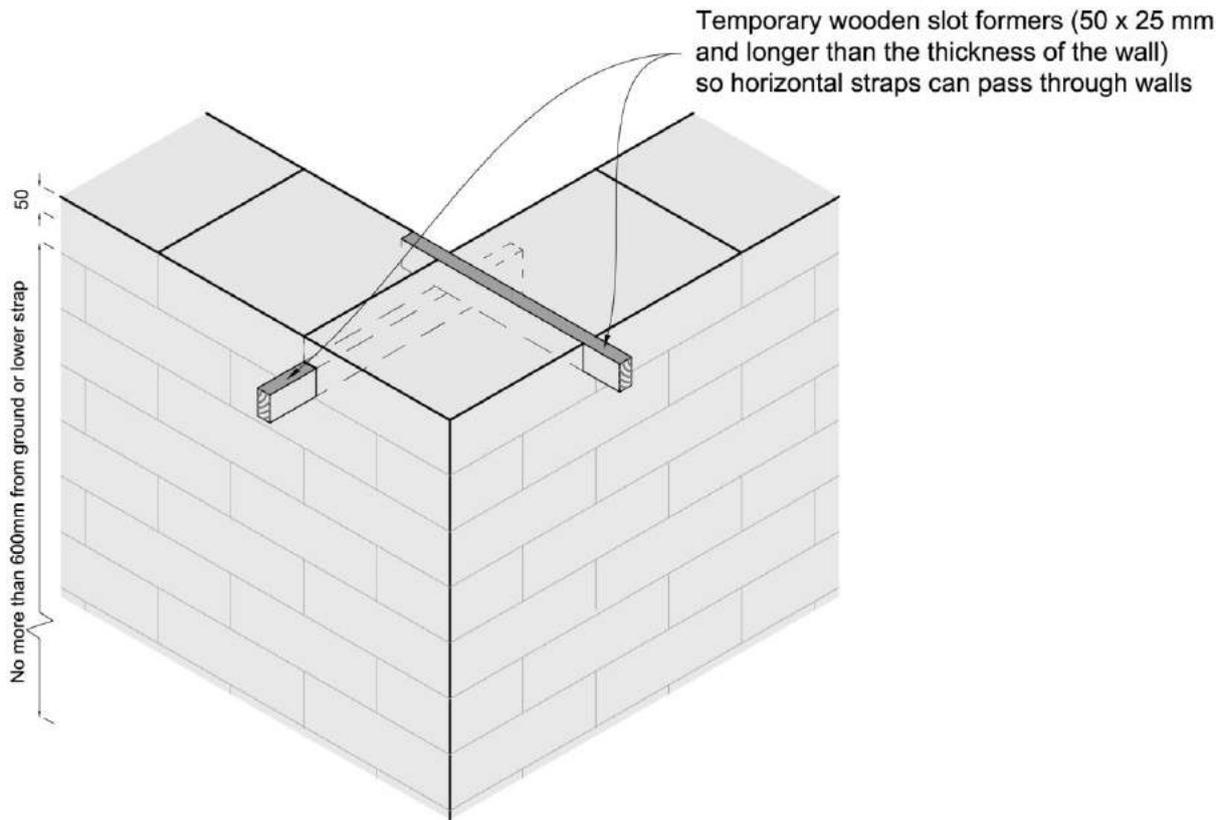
Slot formers reduce the need to drill through walls at the corners of new construction.
